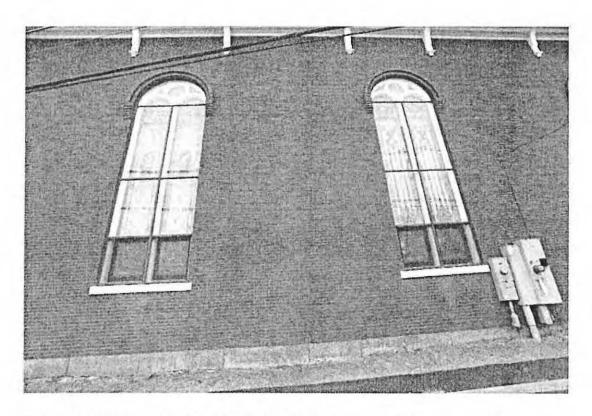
North Elevation Window Details, 1861 Portion, January 2020
